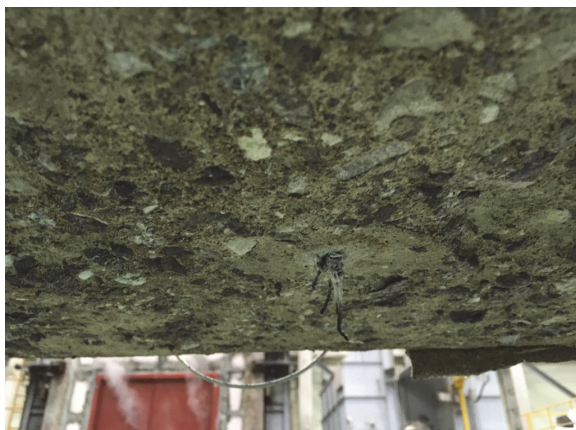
Interface surface of concrete slab after cementitious matrix spalling off
